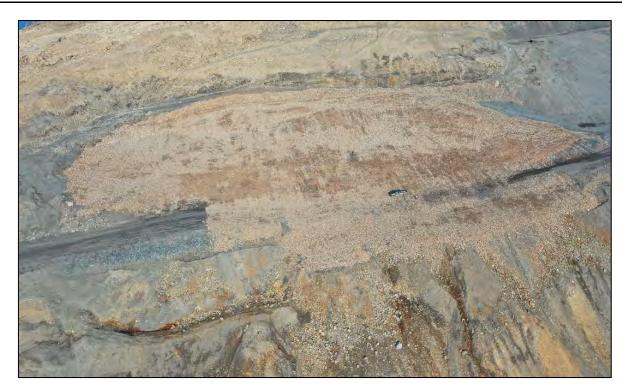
West Open Pit – Overview looking Northeast from UAV.
